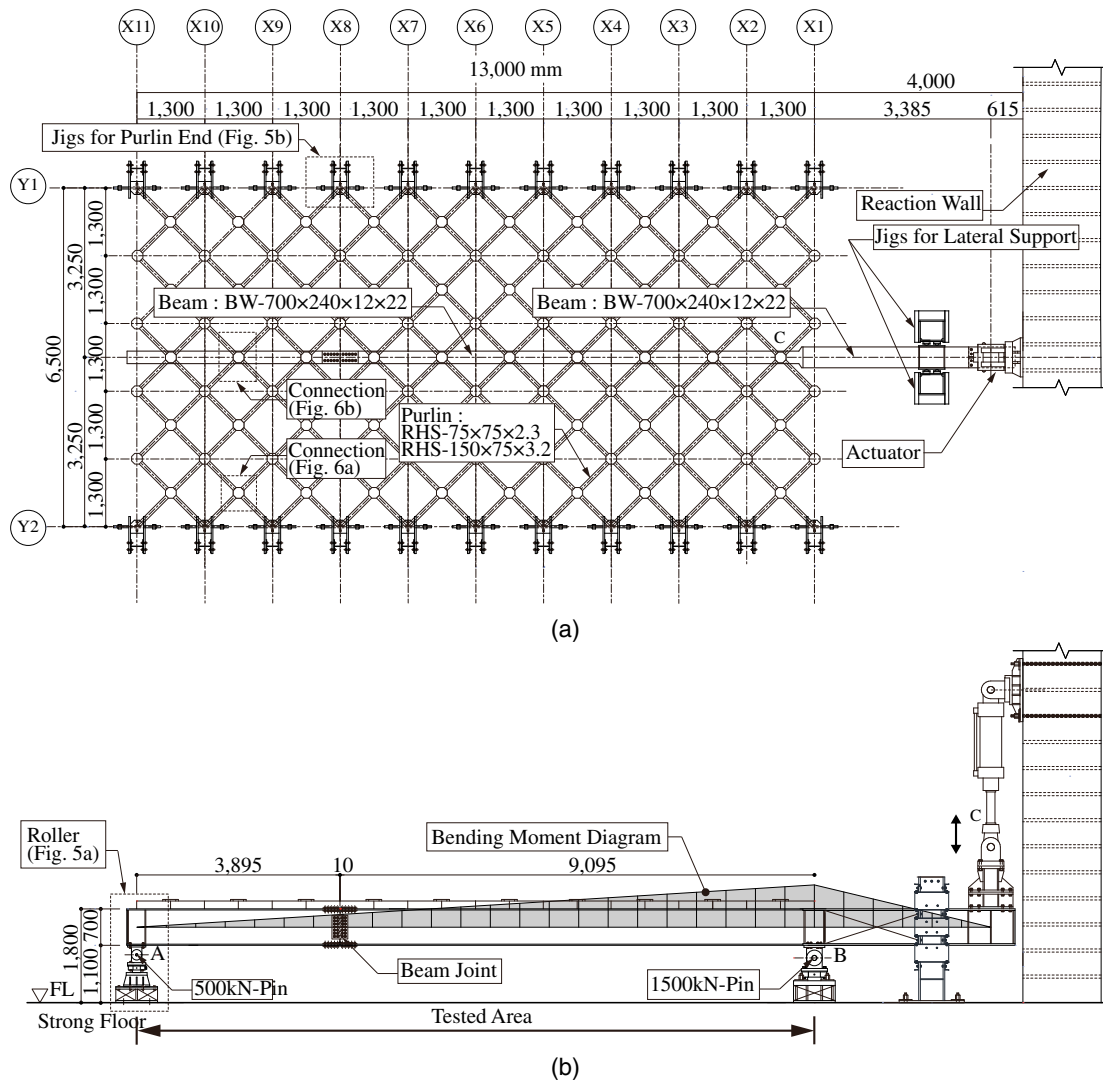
Test setup: (a) plan view; and (b) elevation view.
